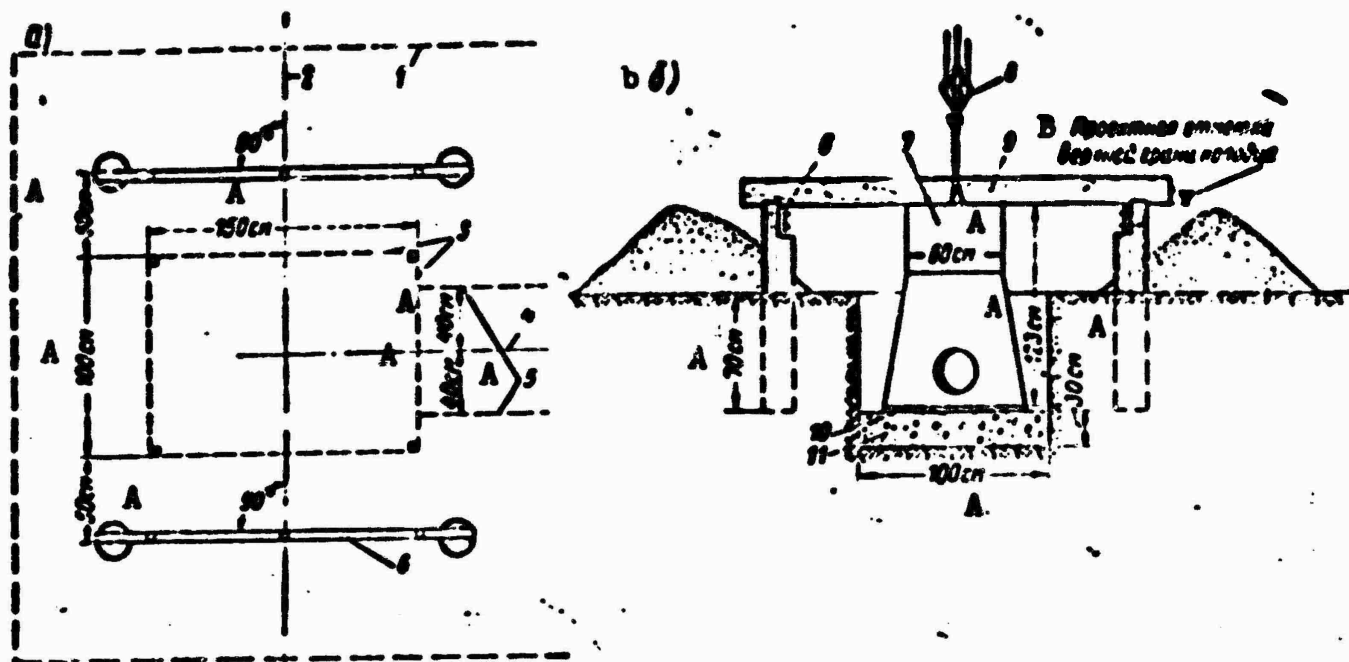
Constructing a catch basin from precast slabs. a) Scheme for placing the sight rails; b) installing the catch basin sections. 1) contour of the concrete pavement slab; 2) axis of the concrete pavement gutter; 3) boundary of the catch basin pit; 4) axis of the drainpipe trench; 5) boundary of the drainpipe trench; 6) sight rail (a 5 x 15 cm board); 7) basin section; 8) truck crane hook; 9) template rod (5 x 5 cm); 10) leveling cement grout layer; 11) sifted slag foundation. A) cm; B) design elevation of the upper edge of the basin.
